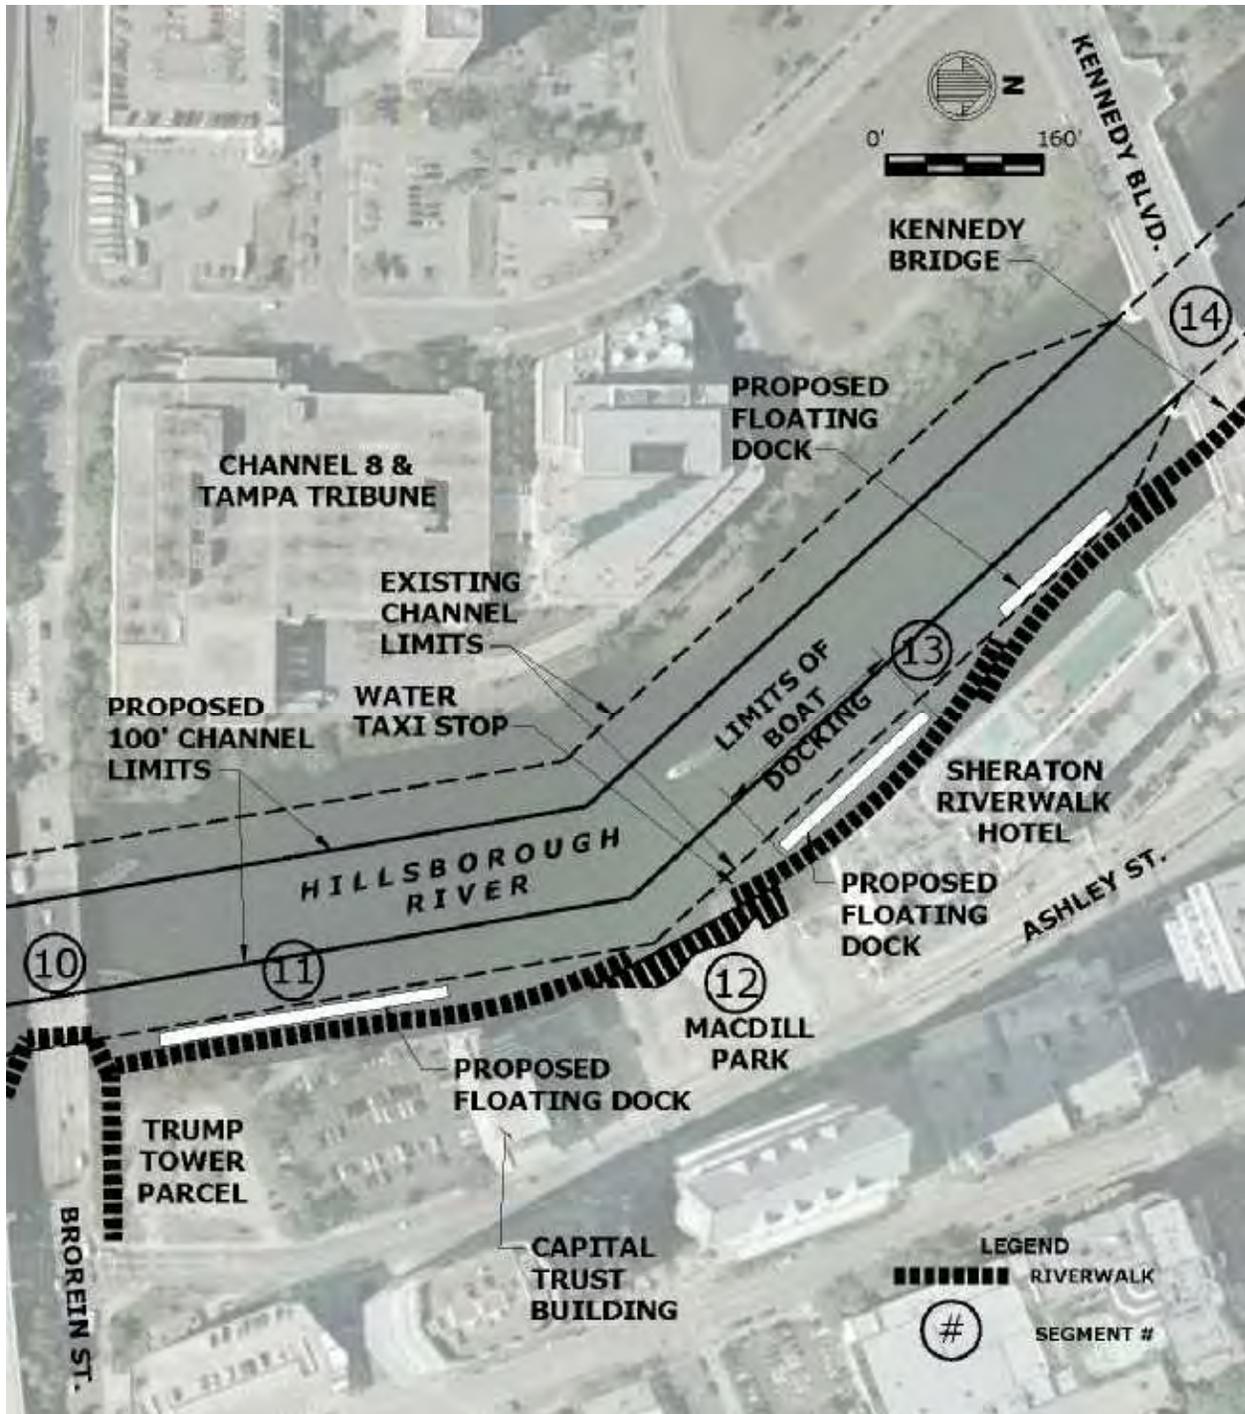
Brorein Street Bridge to Kennedy Boulevard Bridge
